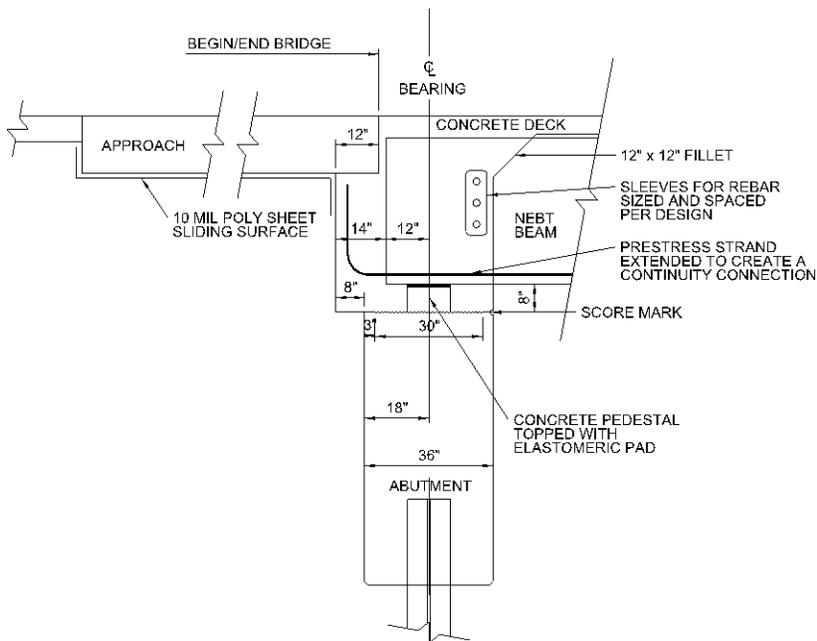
2 North East Bulb Tee (NEBT) Type A Bridge End Detail
